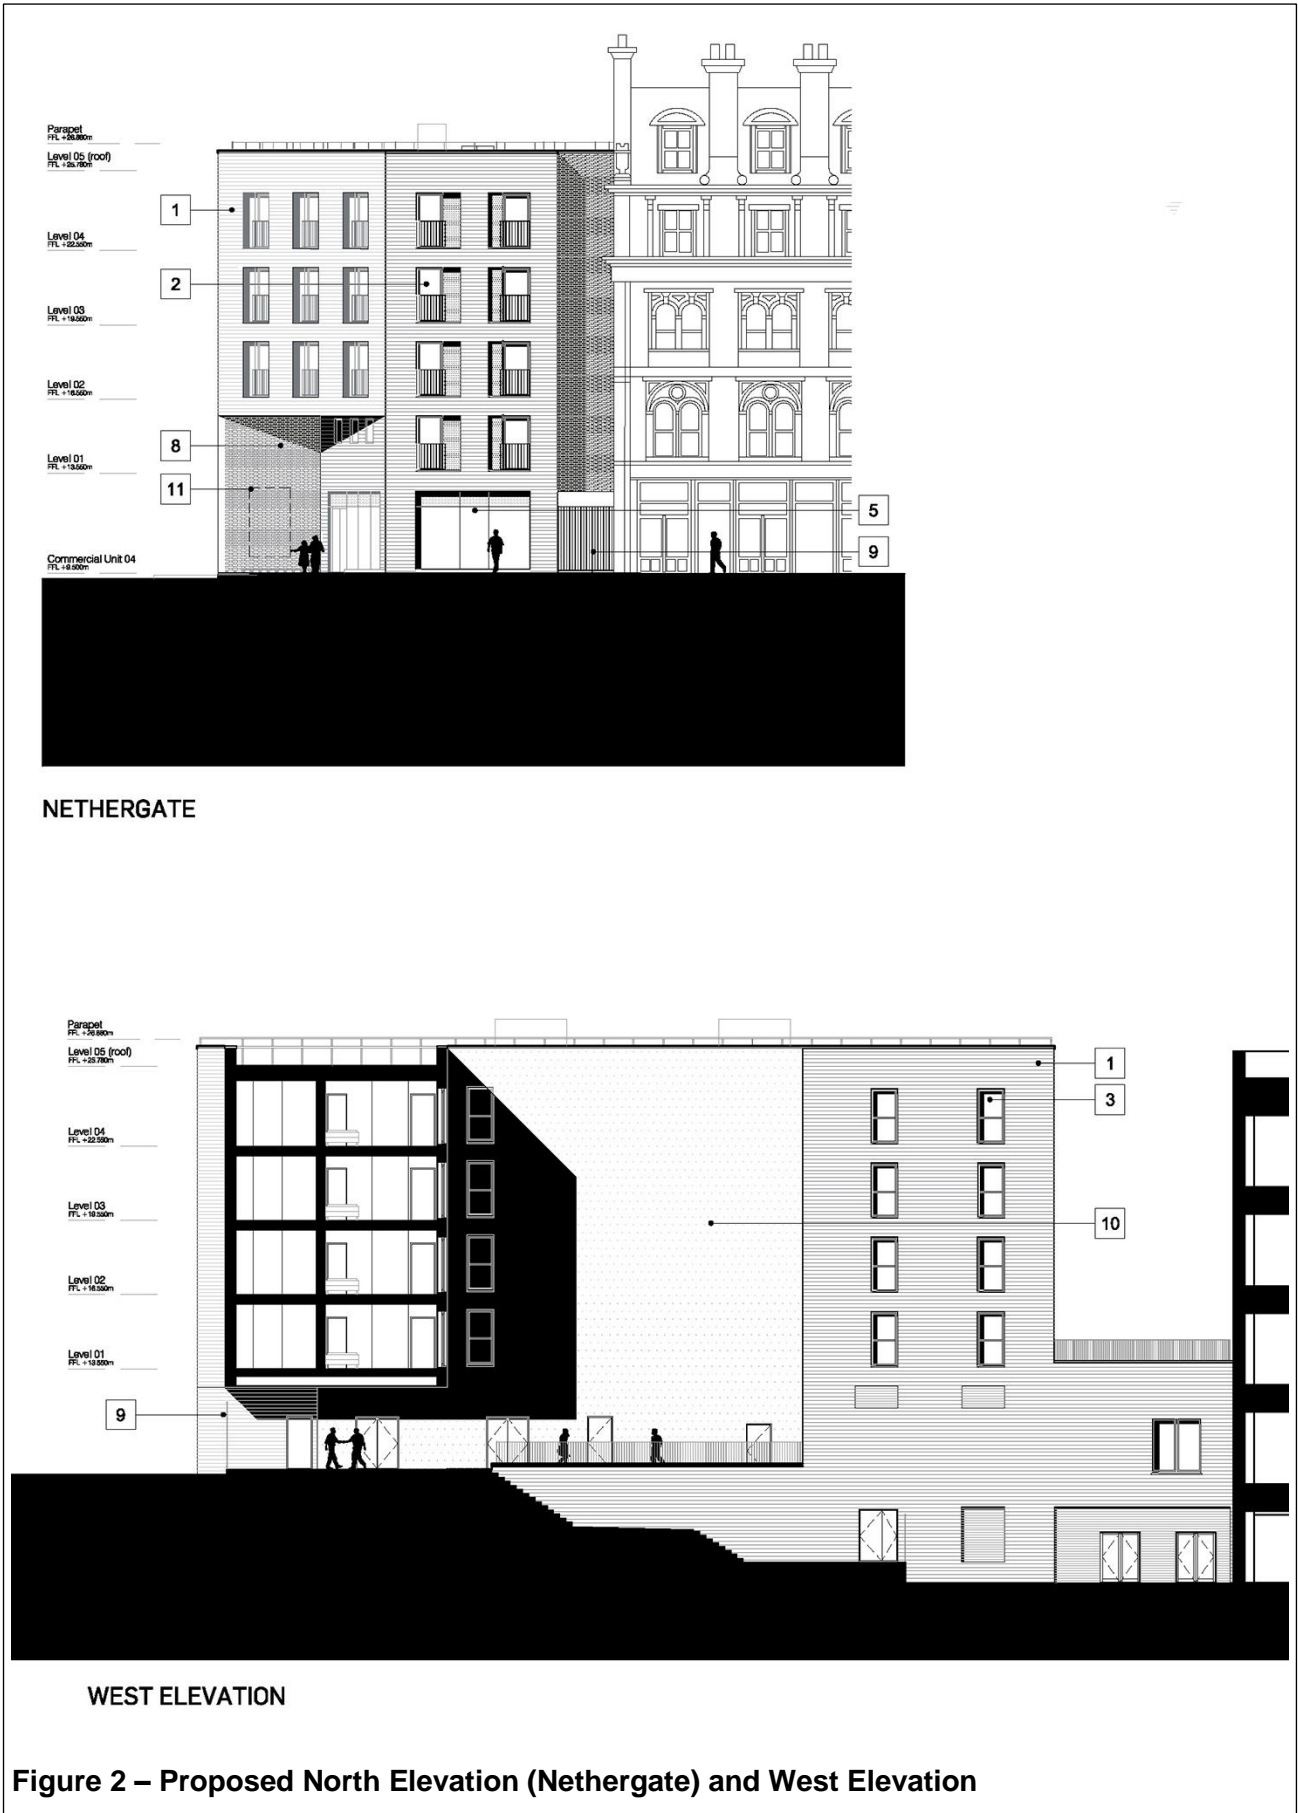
Proposed North Elevation (Nethergate) and West Elevation
